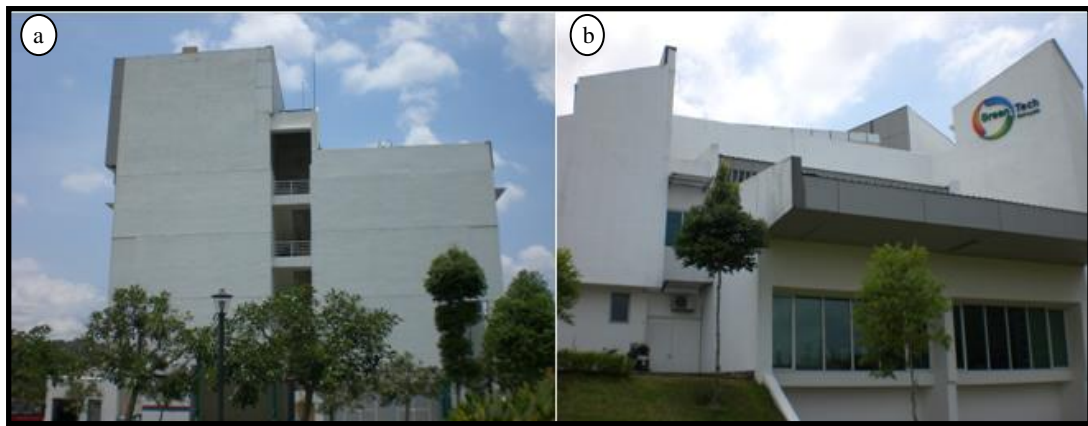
(a) Building wall facing east (b) Building wall facing west
